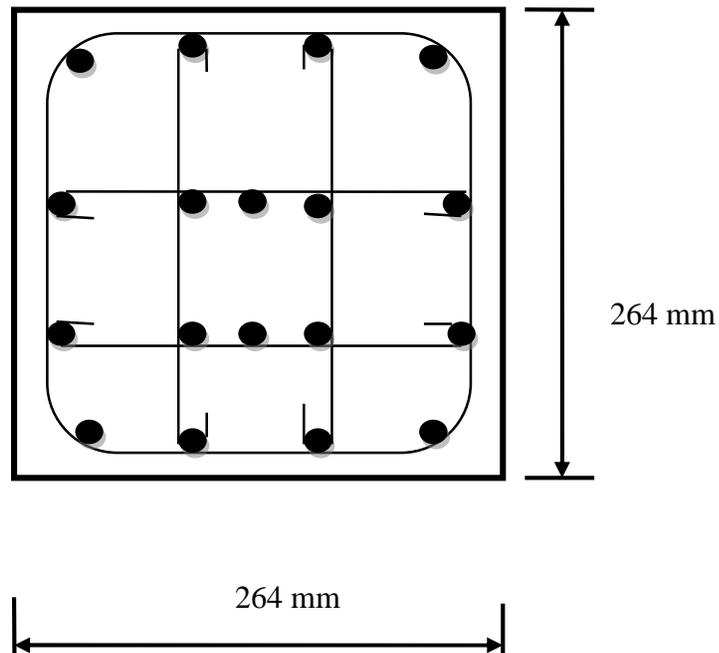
Cross-Section of the Mangrove Reinforced Concrete Column
